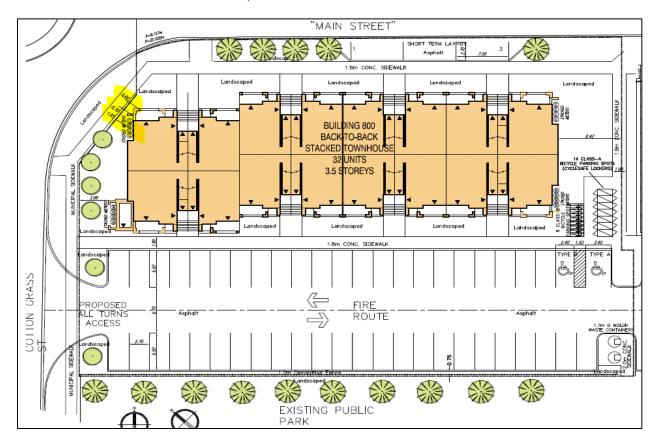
Conceptual Site Plan (February 2023, 4 Architecture Inc.)
